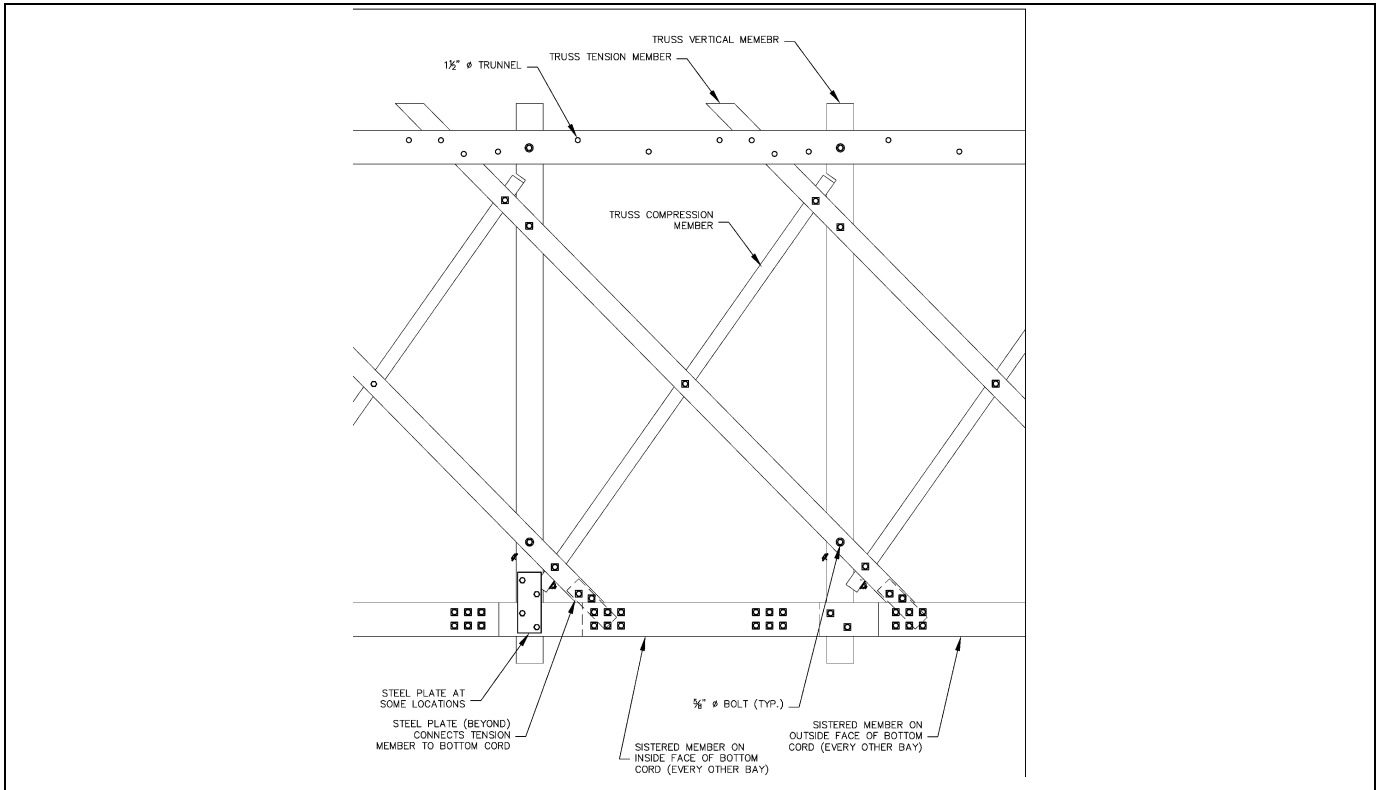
Vertical truss members, existing conditions detail (source: HEB 2012)
